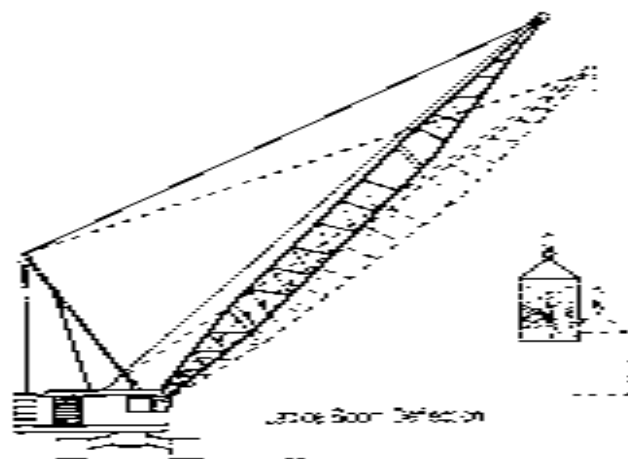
and #318 show cranes increasing the load radius due to deflection. As the load resists moving, the machine components will stretch, bend, give, and tighten up slightly, causing the boom tip to move down and out. This deflection is magnified on a machine on rubber tires.
